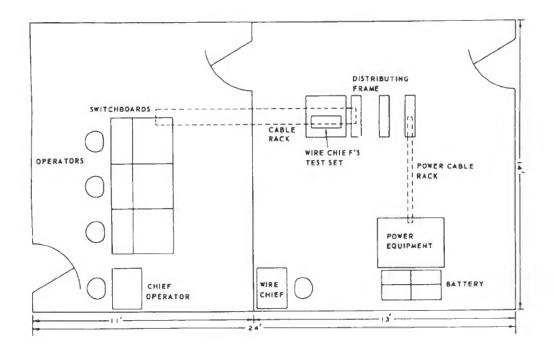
Suggested floor plan for telephone central office set TC-10 in one room.
